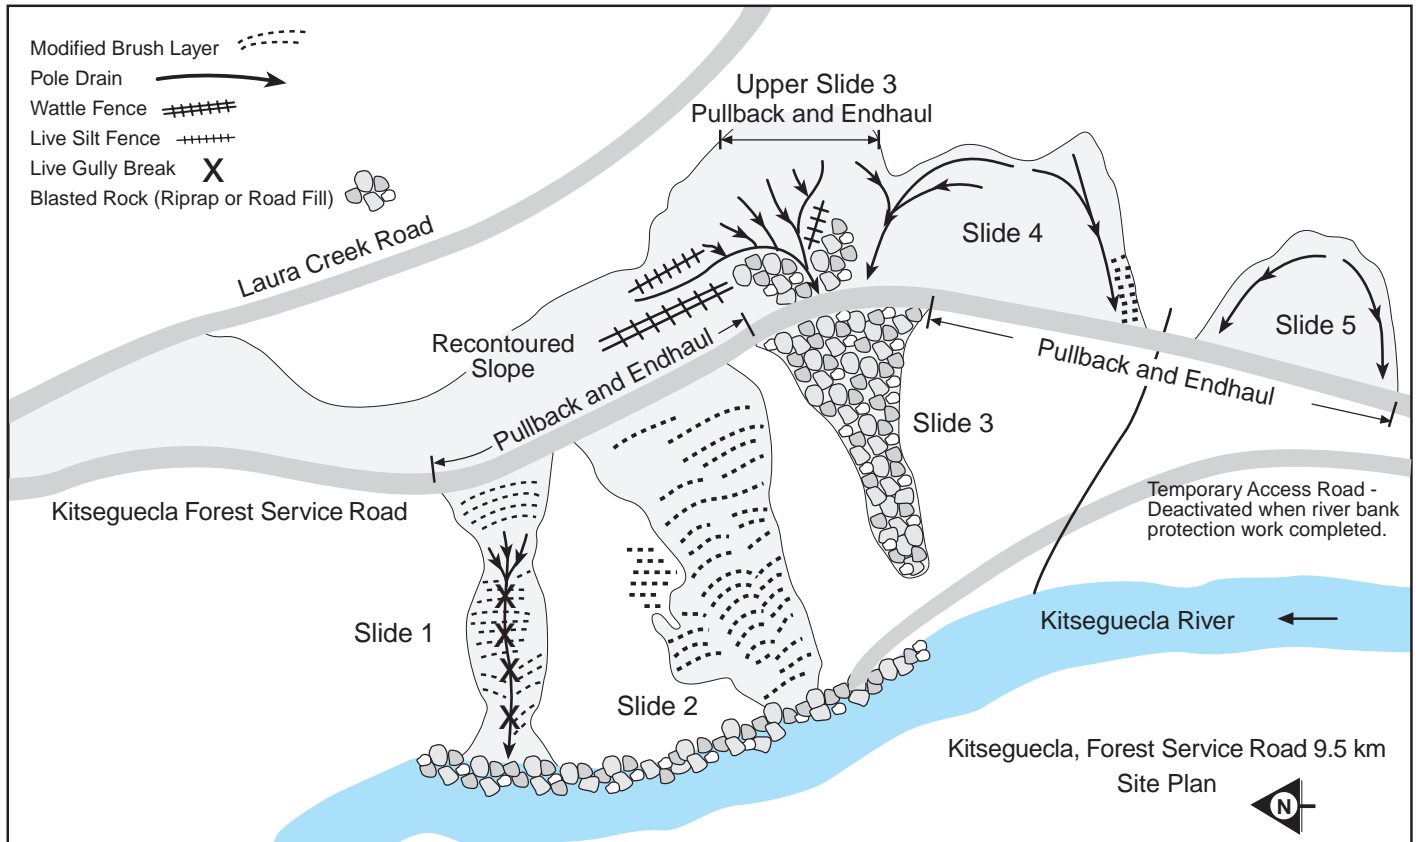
Site plan showing location of various completed conventional and bioengineering work (adapted from Rabnett 1997)
